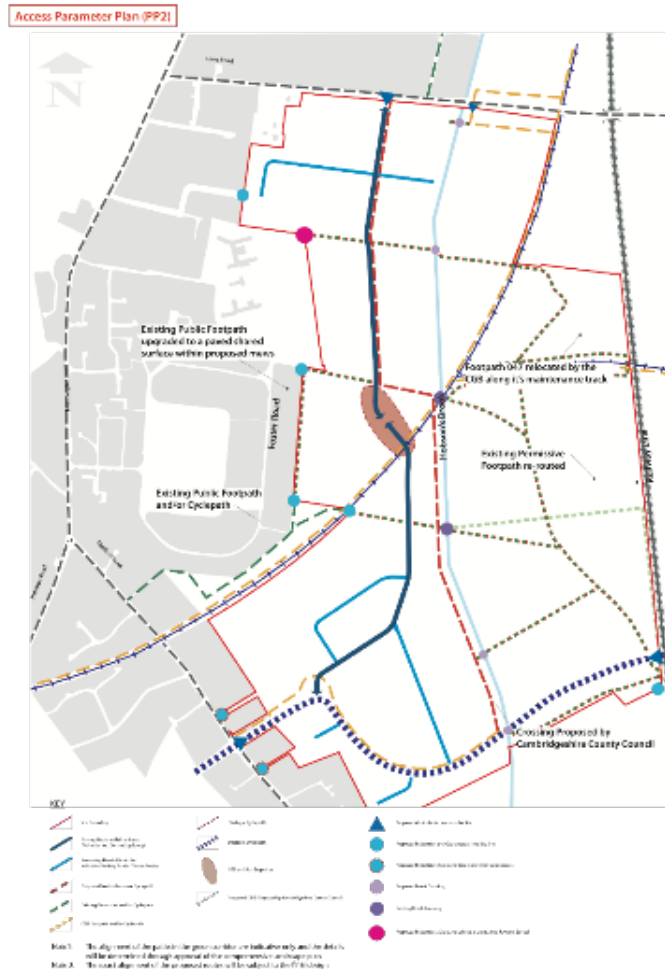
Clay Farm 'Development Proposal Parameter Plan, PP2 Access. REV B'
